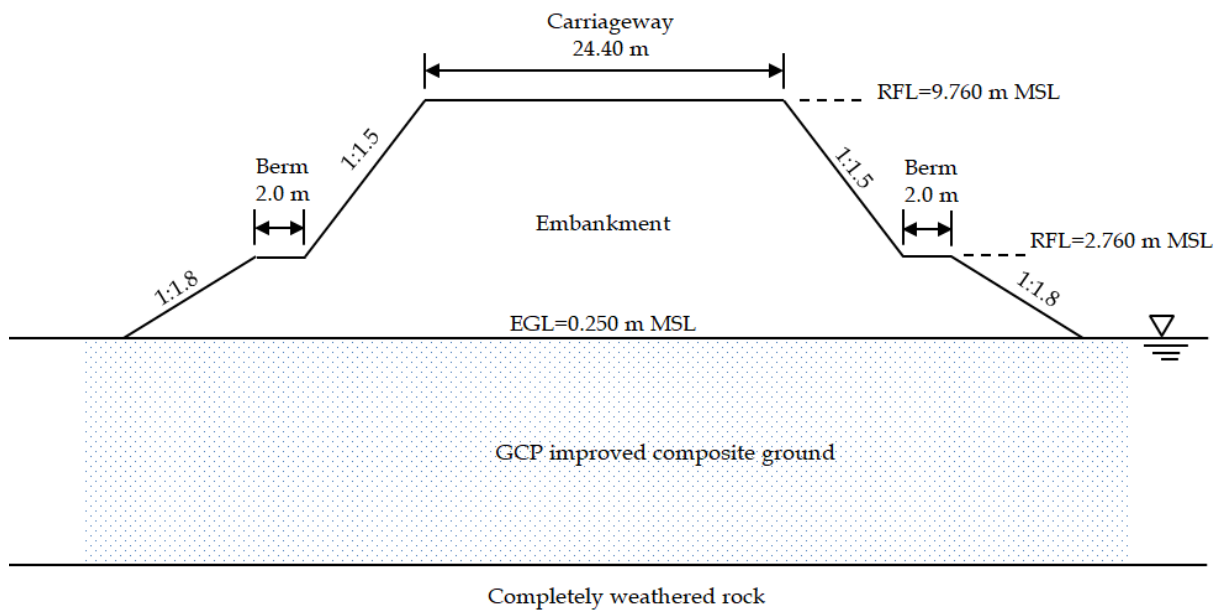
Typical embankment at Ch. 7+405 – 7+475
